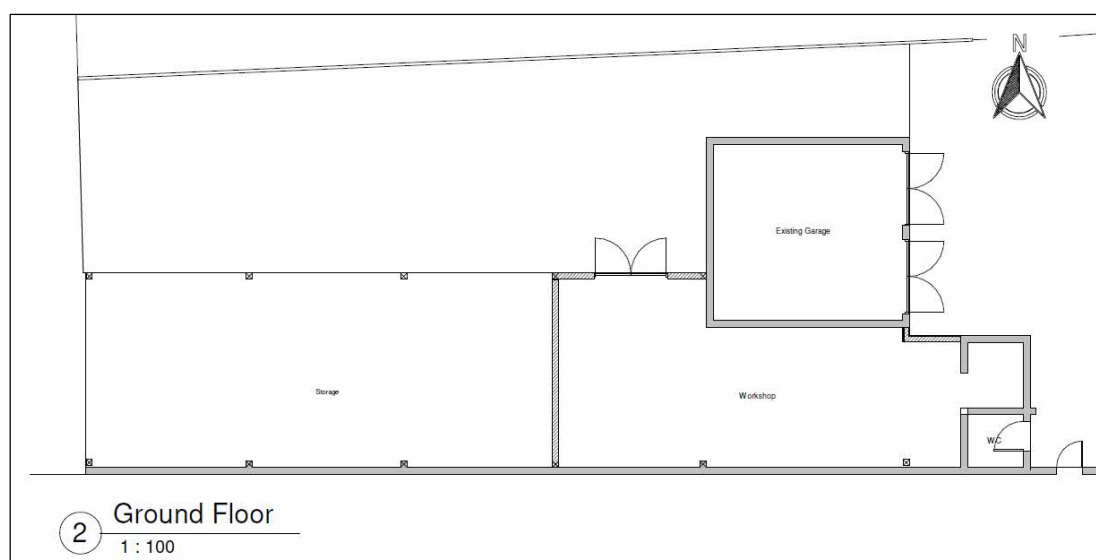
The surveyed buildings are shown above. Figure reproduced from drawings dated April 2023 provided by MO Architects, Collingham.
